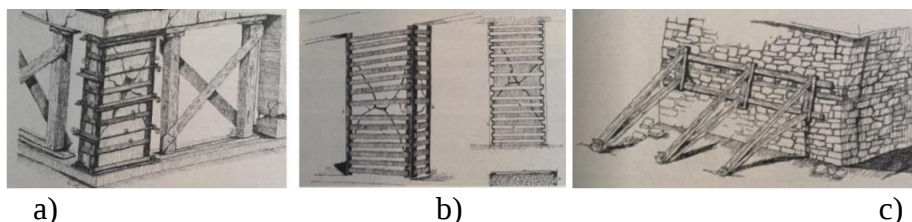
a) b) corsets made of wooden or metal elements to ensure the resistance elements of the buildings strongly cracked / cracked or broken by shear force; c) Buttresses to support the walls of the facade masonry [1]
